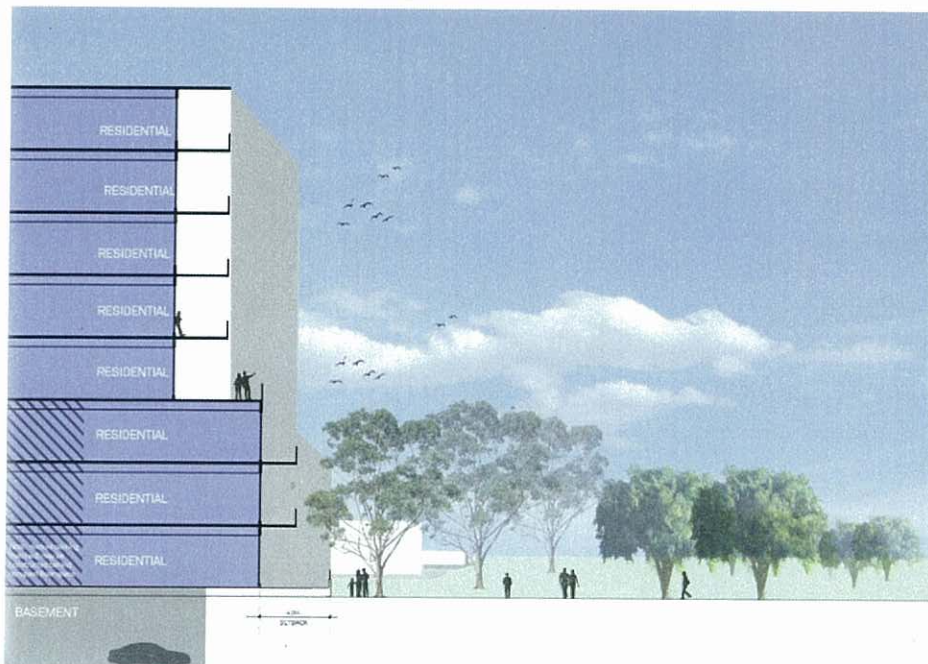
\_Typical cross section of high density residential directly adjoining public open space
